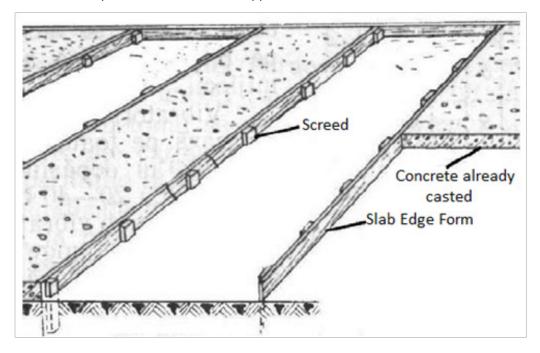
Components of a Slab-on-Grade Slab Formwork
